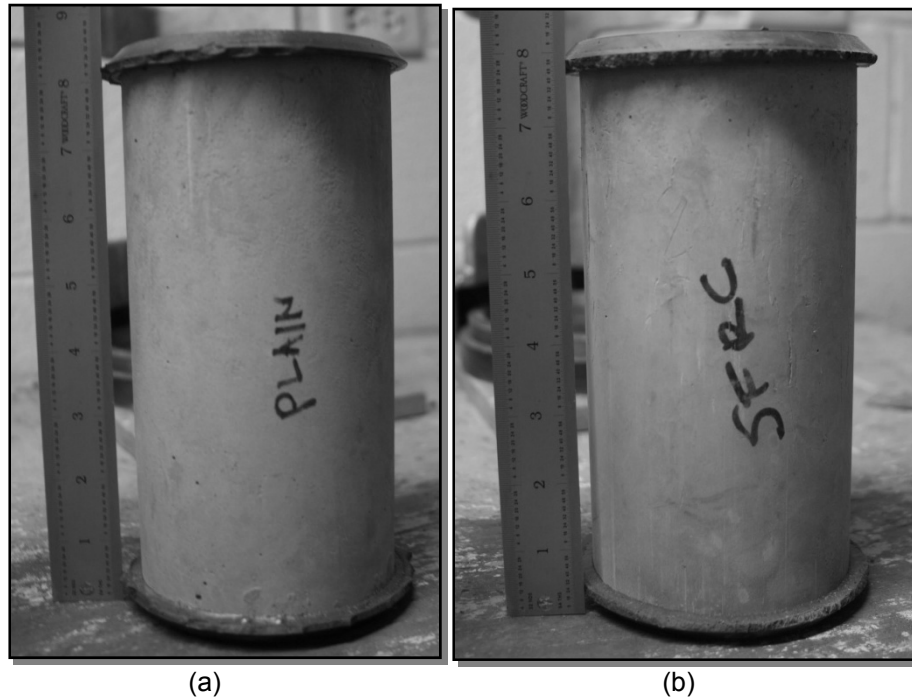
Capped plain concrete cylinder (a) and steel fiber reinforced concrete cylinder before testing (b)
